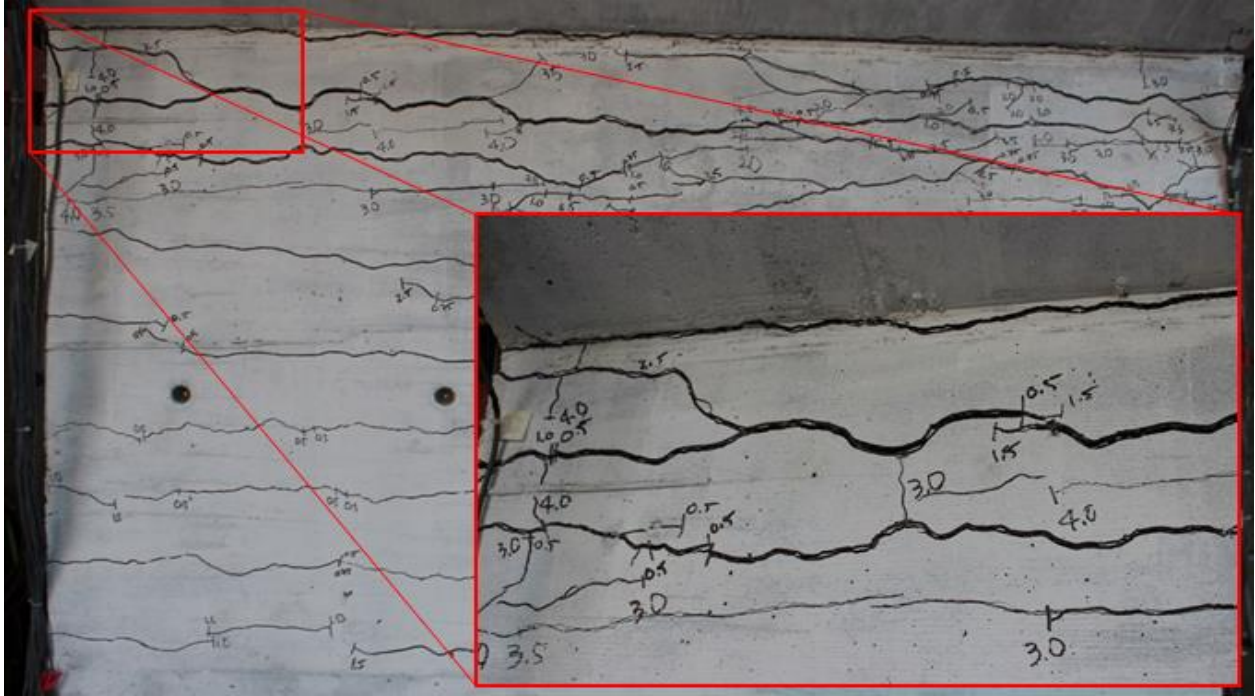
Significant flexural cracking, 0.25" maximum crack width at roof/south wall interface during positive extension at 4.0% drift ratio (Cycle 19-20). Picture of inside South wall at roof looking South
